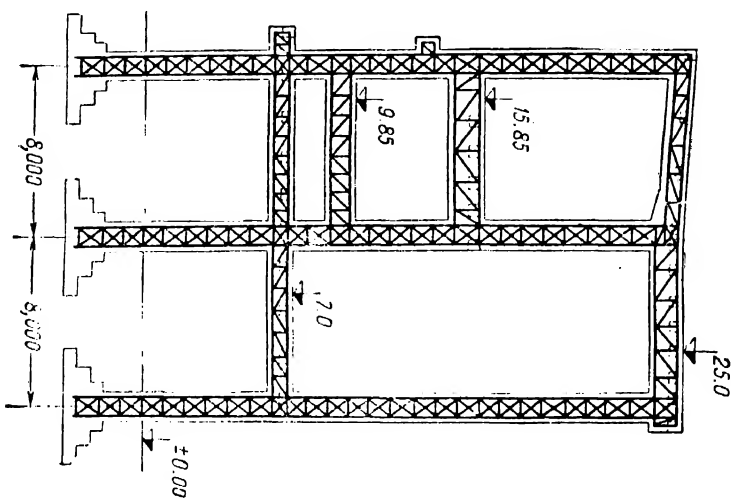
Sketch of self-supporting reinforcement blocks that make up the multi-storey frame for a powerhouse
